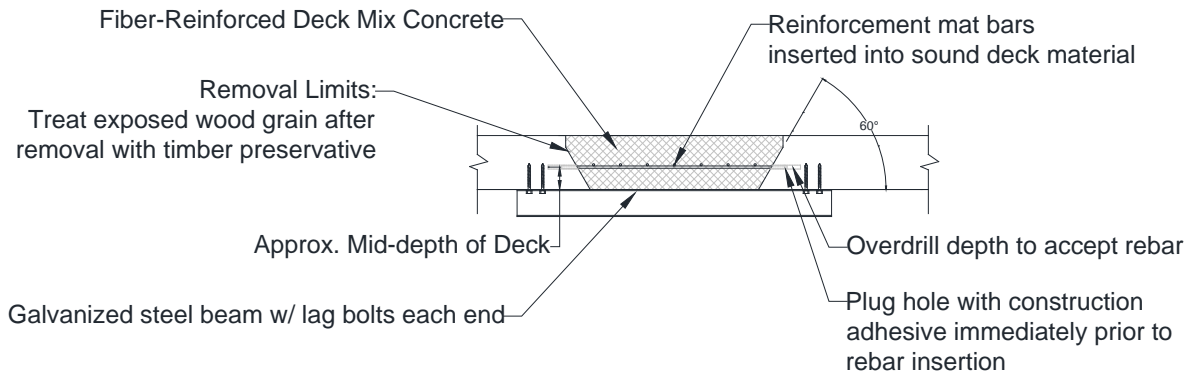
Full-depth laminated deck repair of larger area - detail
